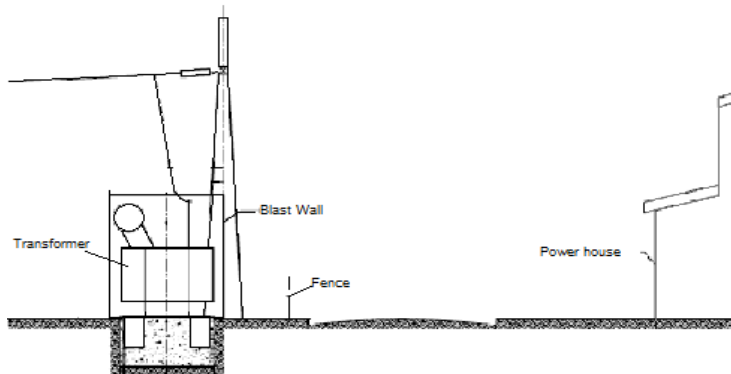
Schematic Drawing of the Layout of Example Transformer 1
